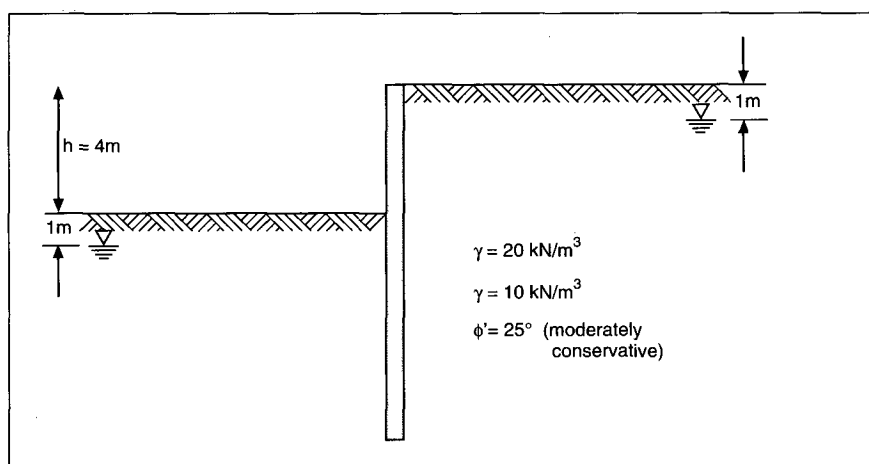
Cantilever wall example (CIRIA Report 104, Example B2)
